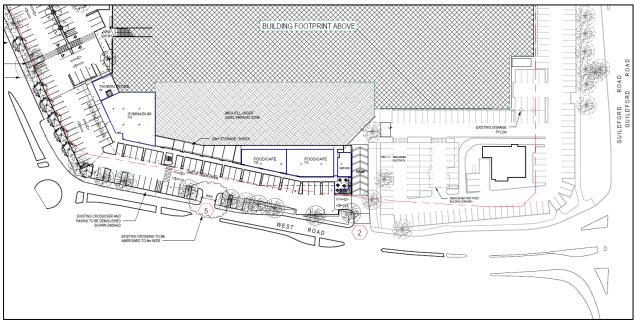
Bassendean Shopping Centre Expansion Access Plan (extract)
